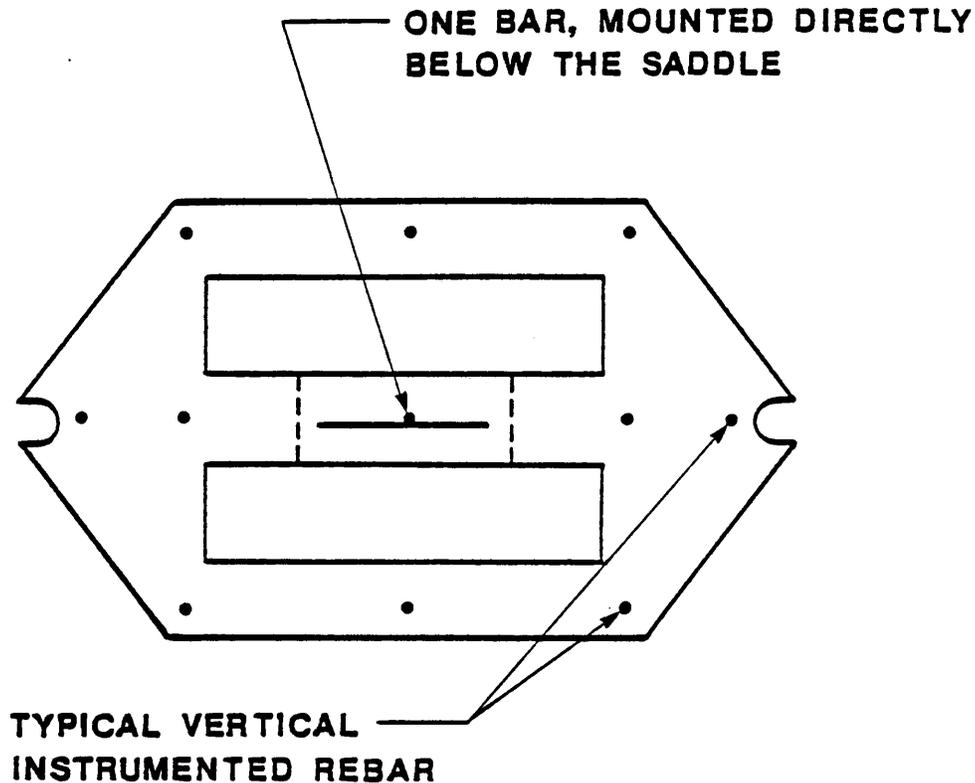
Location of additional strain gaged rebar under stay S7.
